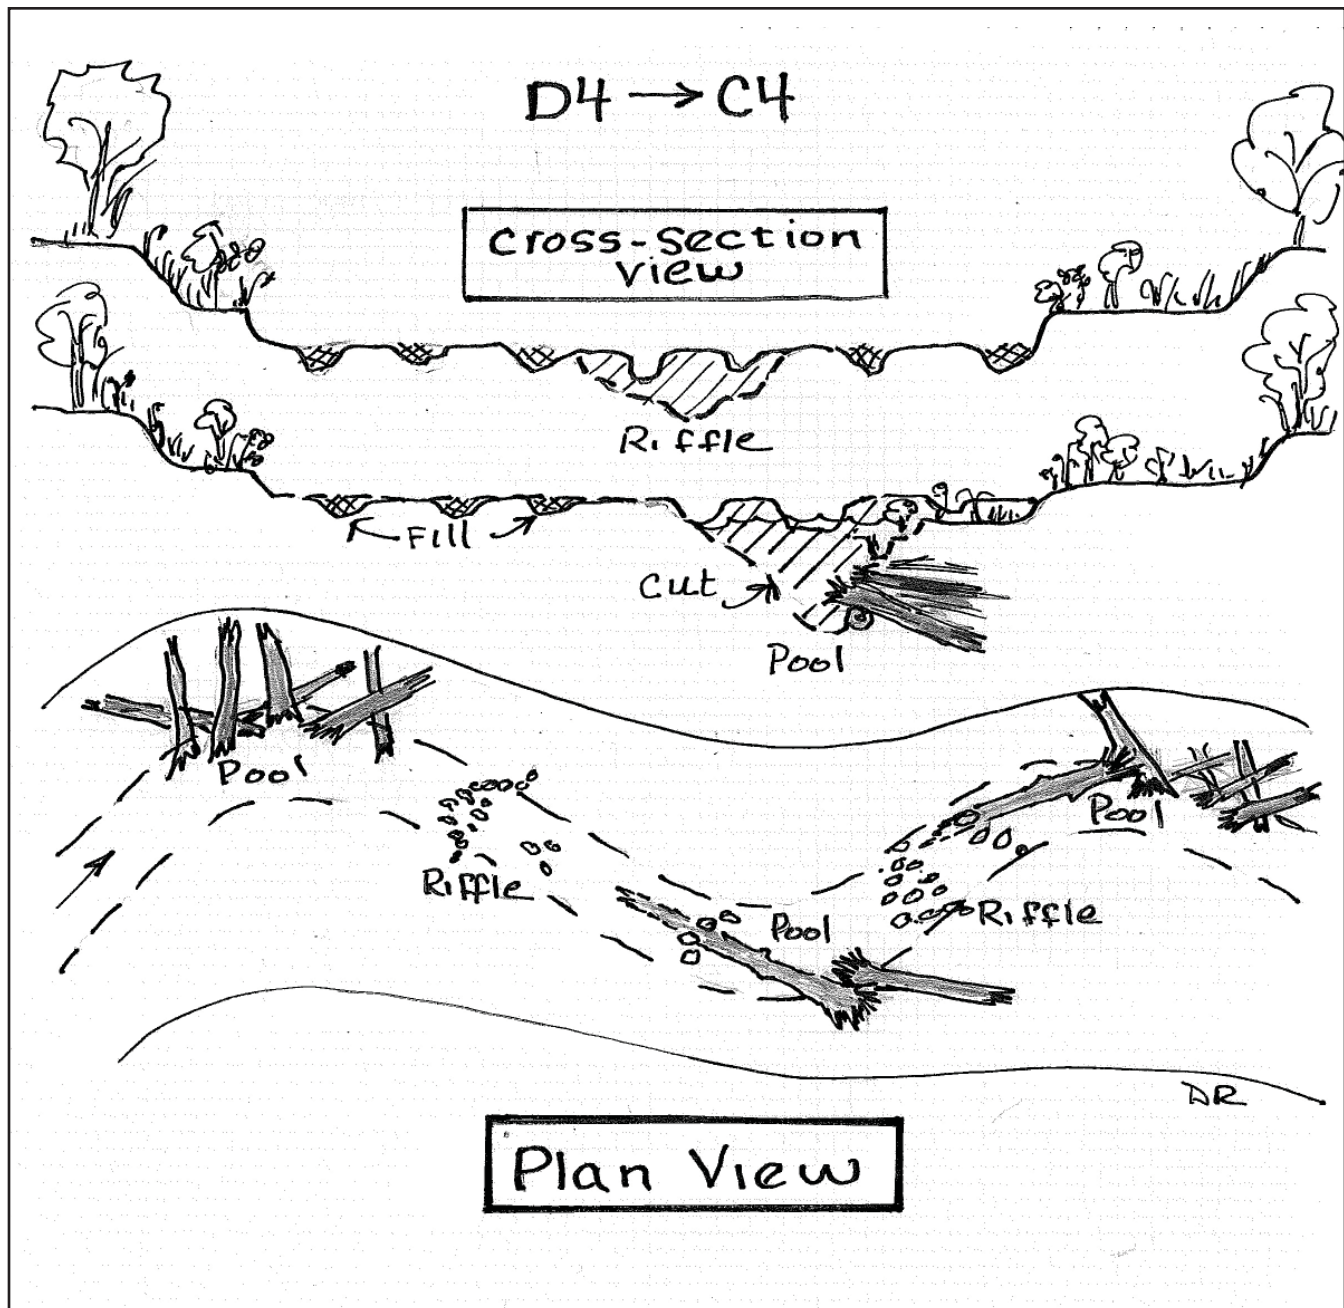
Typical cross-section and plan views illustrating a D4 to C4 stream type conversion in an alluvial fill valley (Valley Type VIII), and the proposed streambank stabilization and fish habitat structures by typical location.
